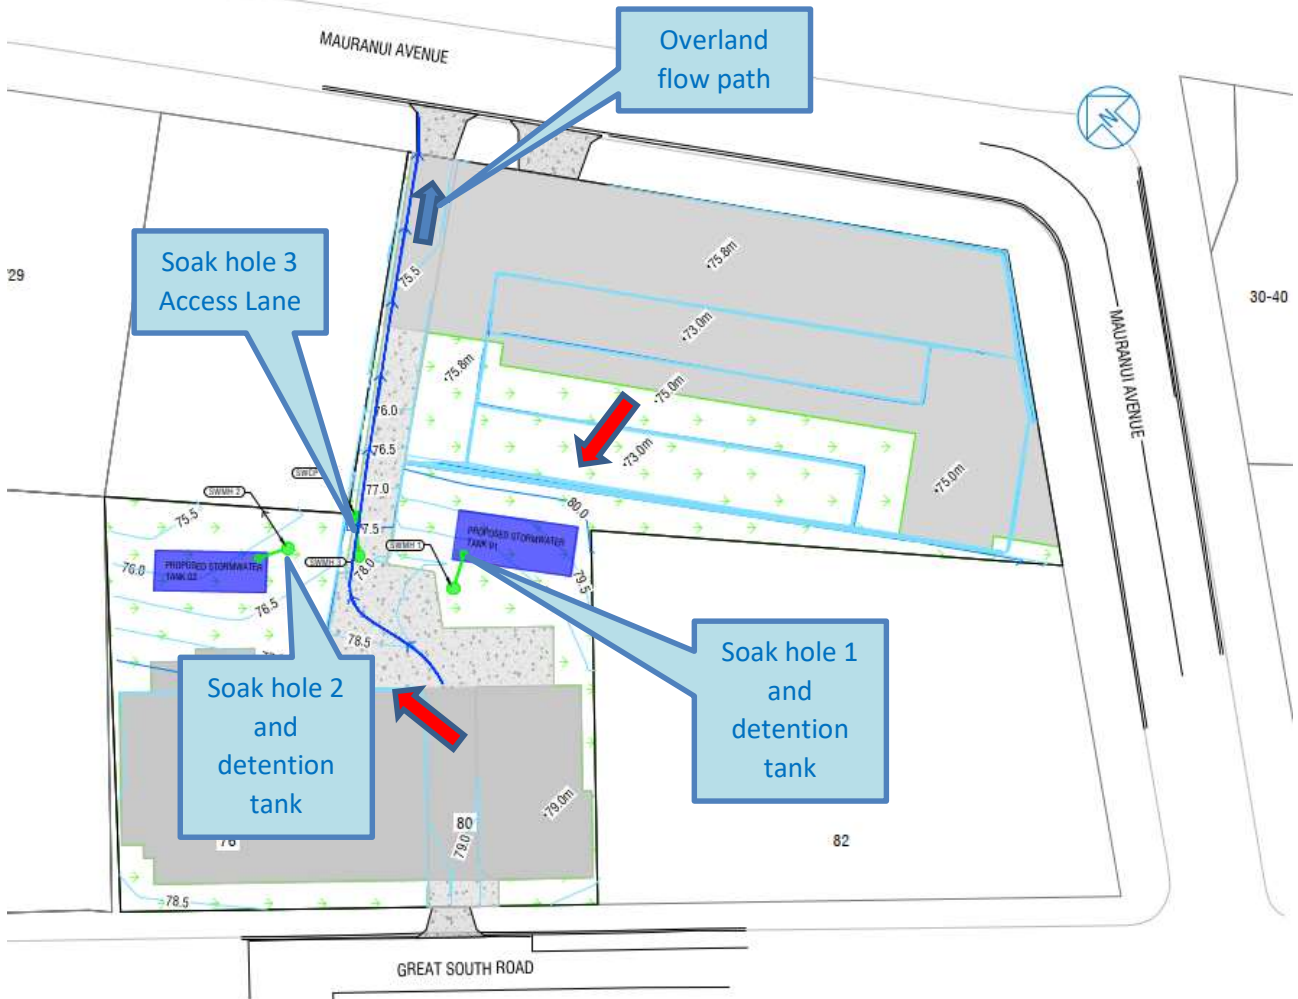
PROPOSED STORMWATER MANAGEMENT PLAN
